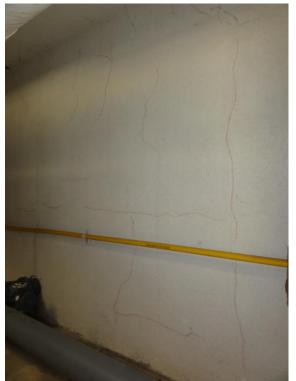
Interior cracking, observed on the north elevation foundation wall (traced in red)
